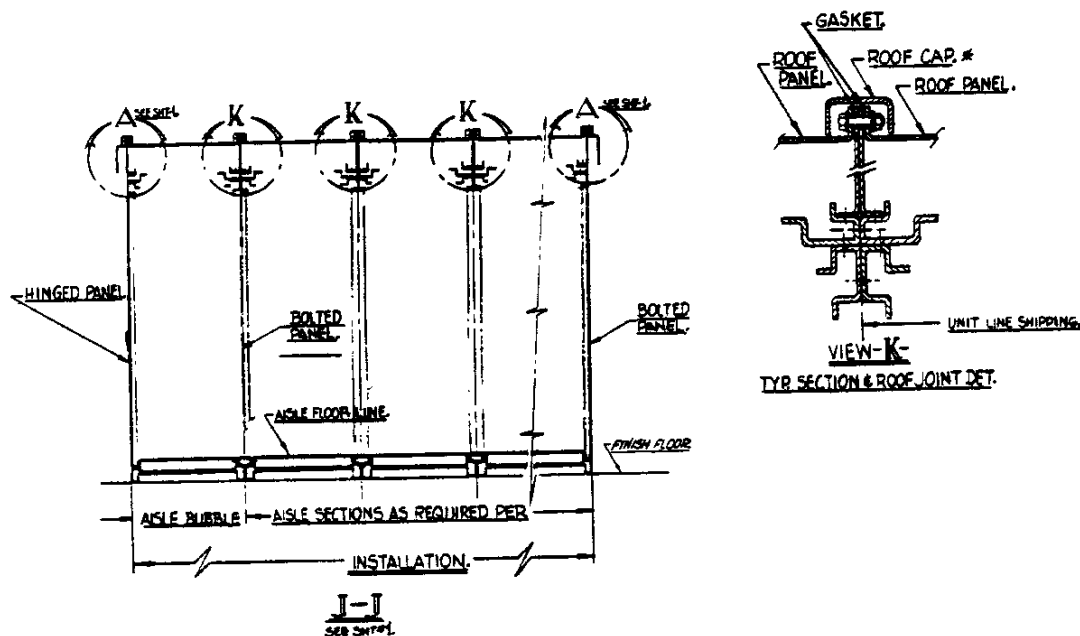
Installation Details for Outdoor Power/Vac* Metal-clad Switchgear with Common Aisle (continued)
